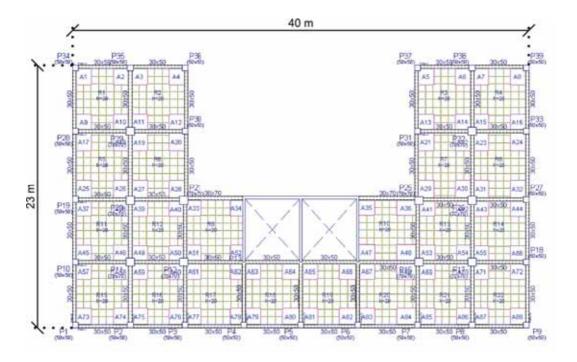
Floor plan of the foundations of the fifteen-storey-building. Source: CYPE software
